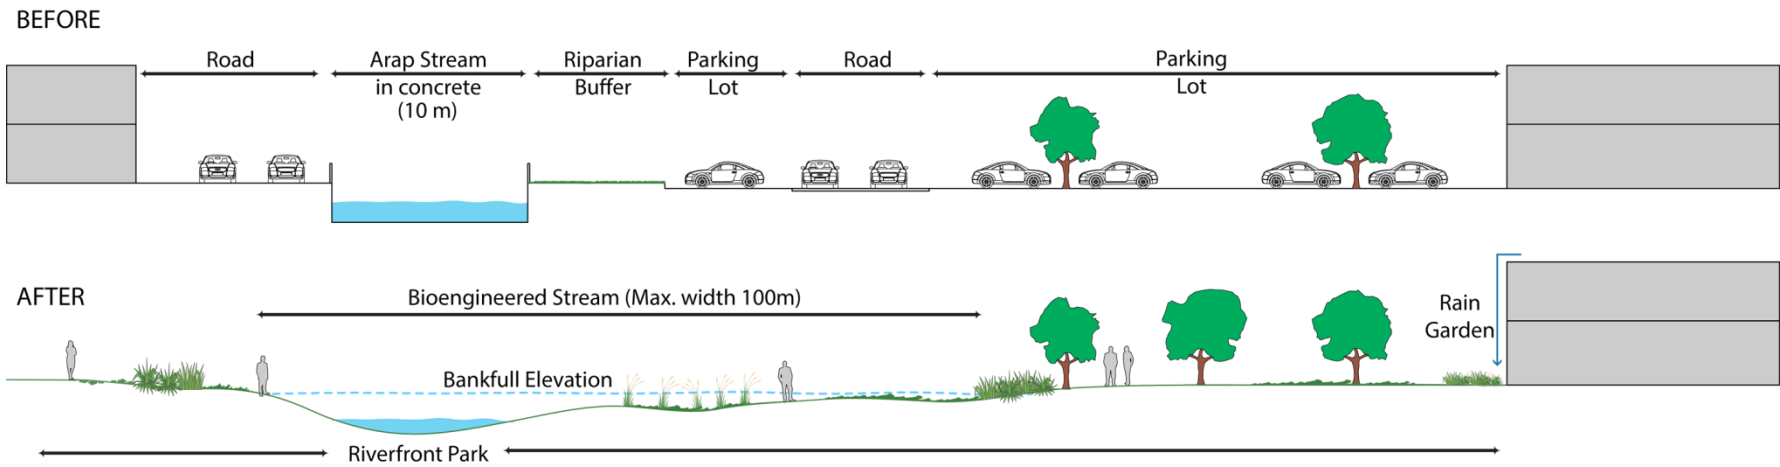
Existing and proposed site cross-sections (Sections A-A')
